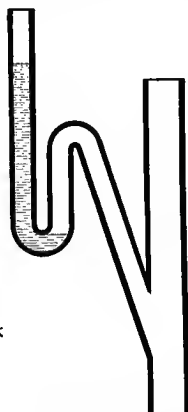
Back Pressure resisted by position of the Trap below the Fixture.
